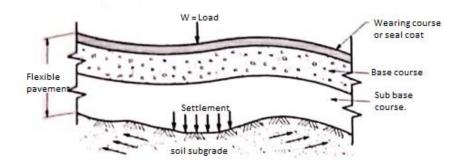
Subgrade failure of flexible pavement.
